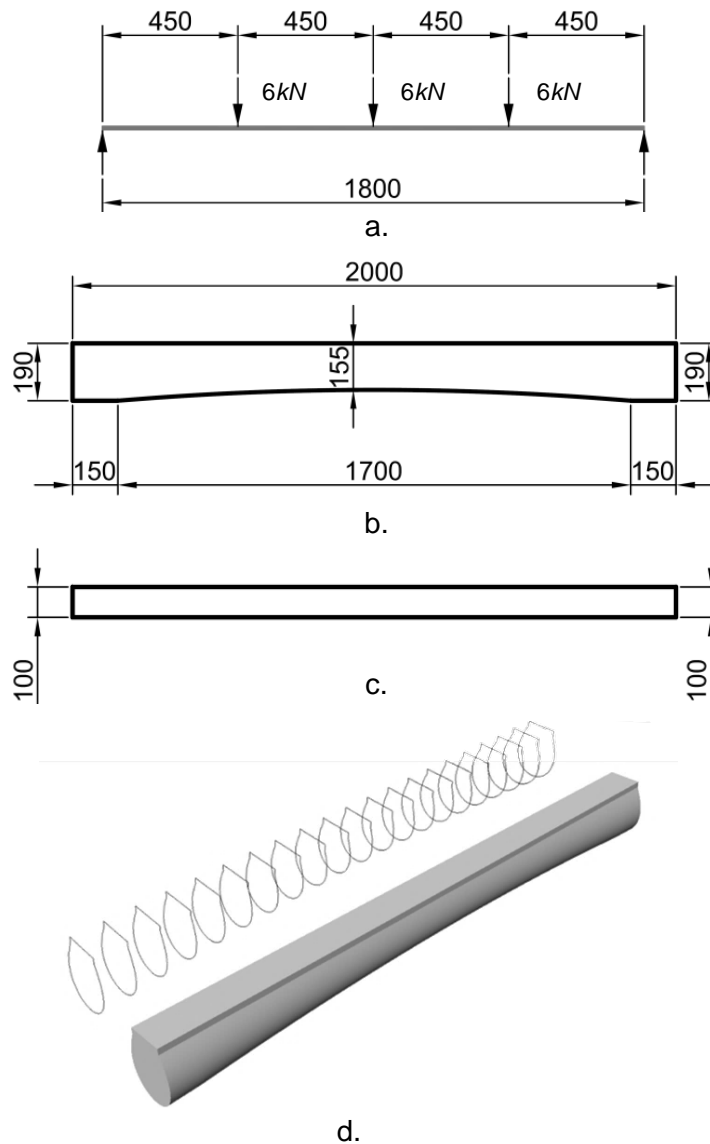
Beam FFB 2 geometry details: (a) loading arrangement, (b) elevation, (c) plan and (d) perspective view (all dimensions are in mm)
